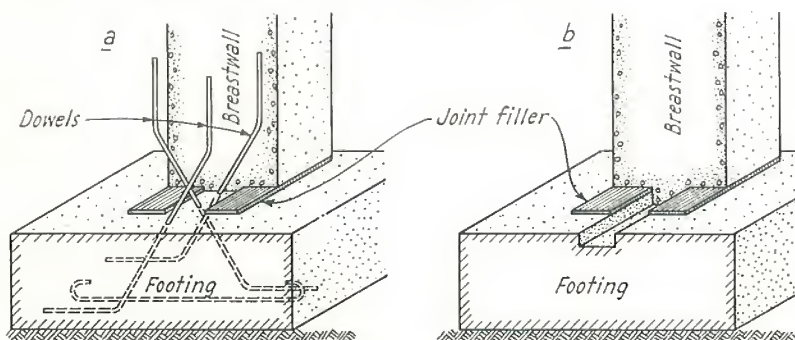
Construction joints with hinge action at top of footings. Type *a* has a better hinge action, but type *b* has a better shear connection.
